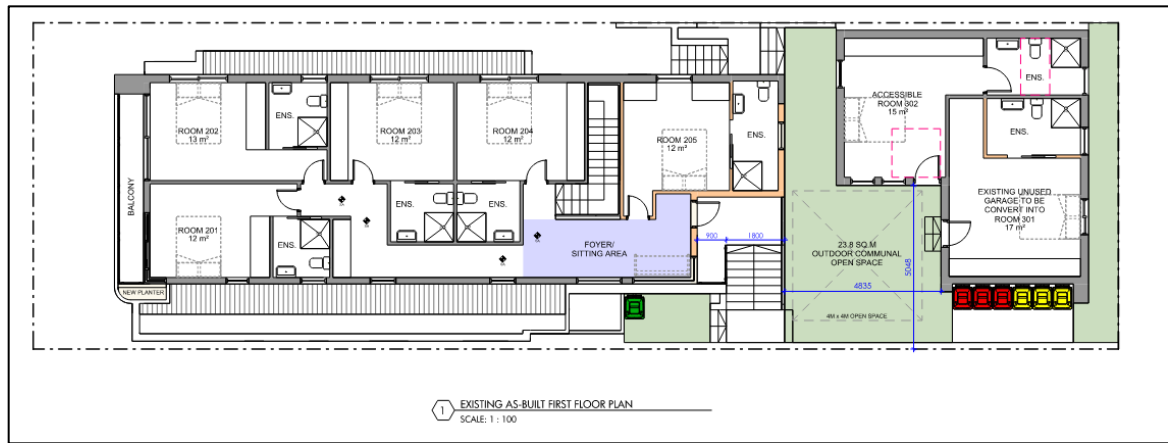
Existing and as-built first floor plan (Source: Applicant)
